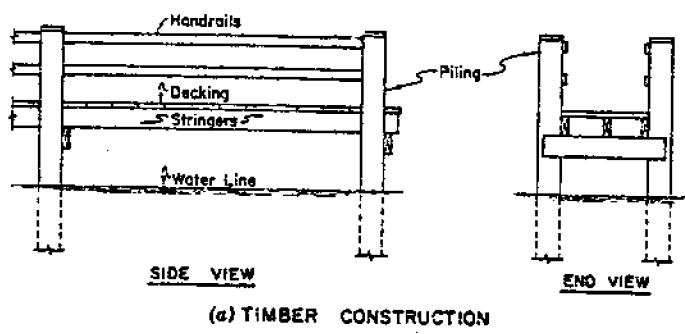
Fixed Pier Construction (Dunham, 1969, p. 97)
